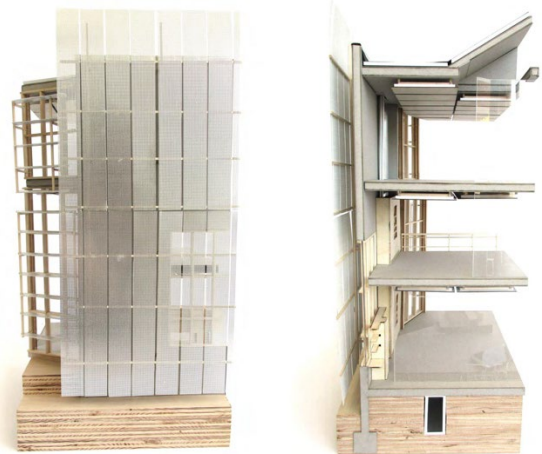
Wall section model (by Kaylan Betten and Amelia Brackmann, 2017)
